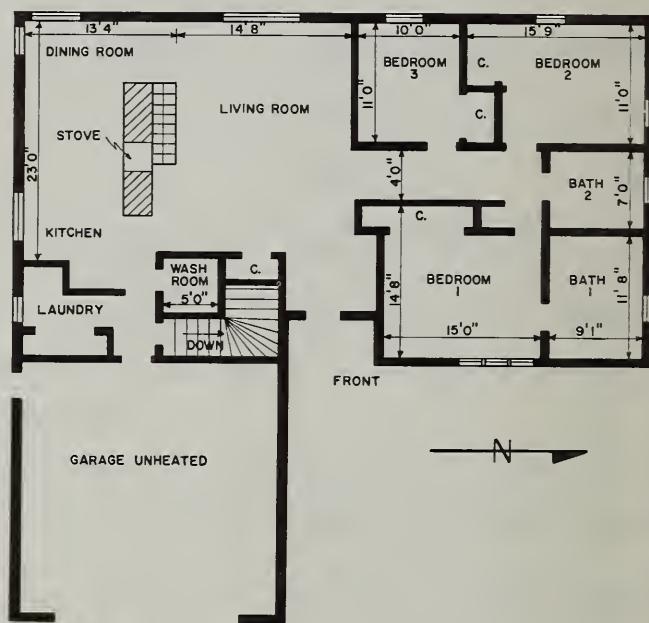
Floor plan of house C, a new 1-story brick veneer structure with a combination basement and crawl space.
